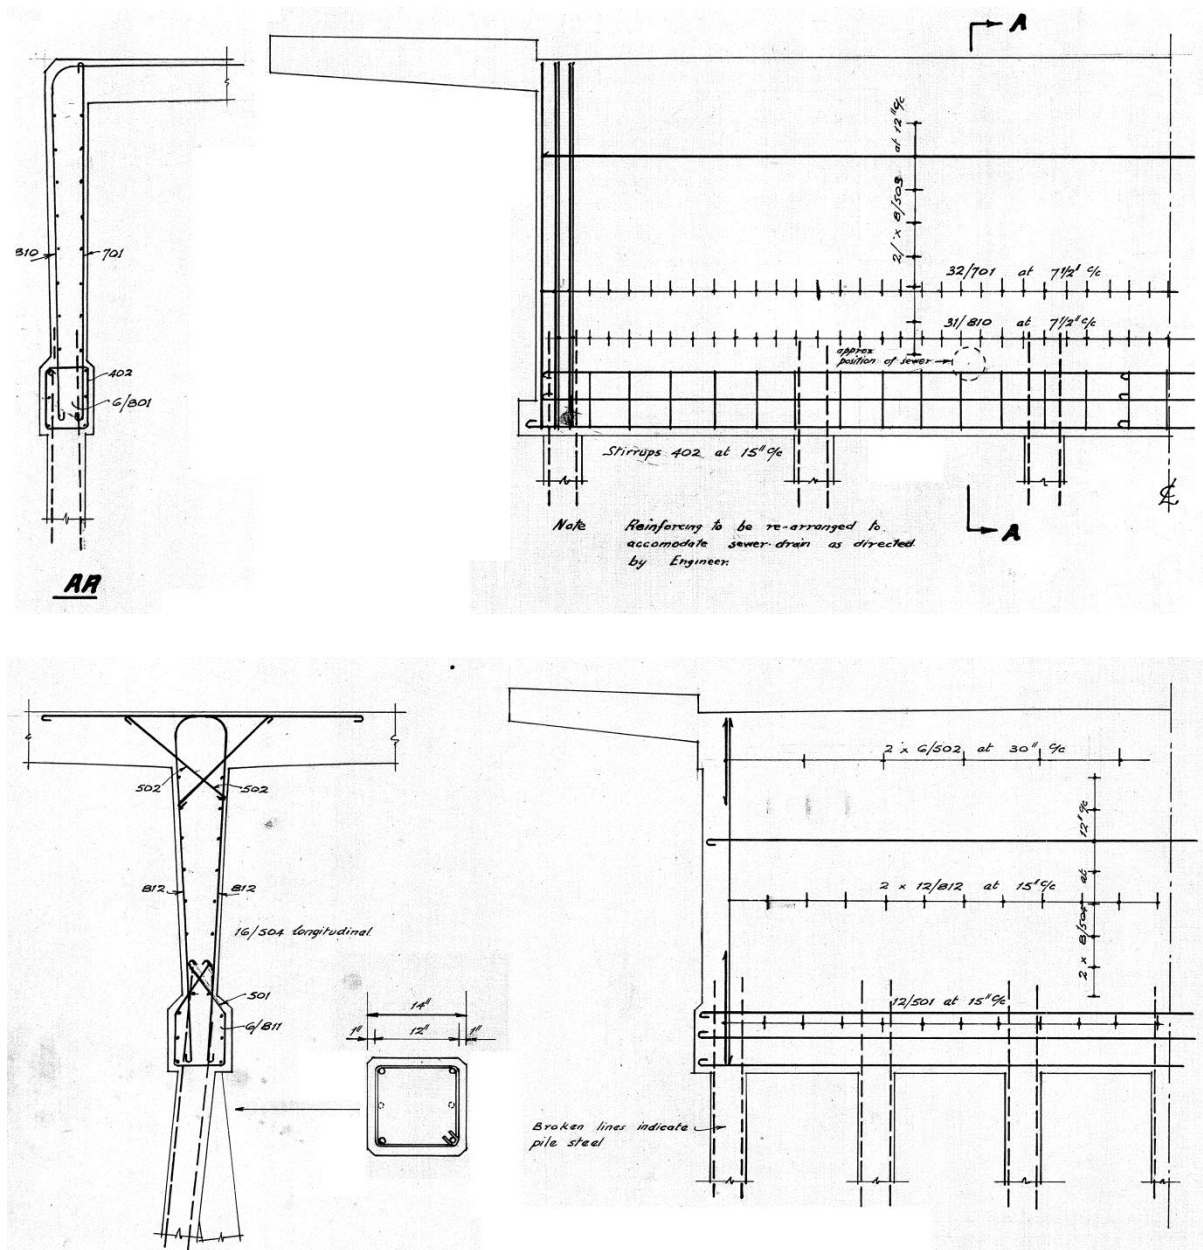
Dallington bridge abutment (top) and pier (bottom) transverse half-sections, showing locations of piles
